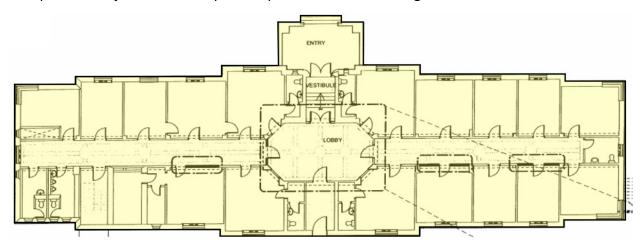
Diagram showing retained sections of the building for Option 1 'retention *in situ* and reuse'
